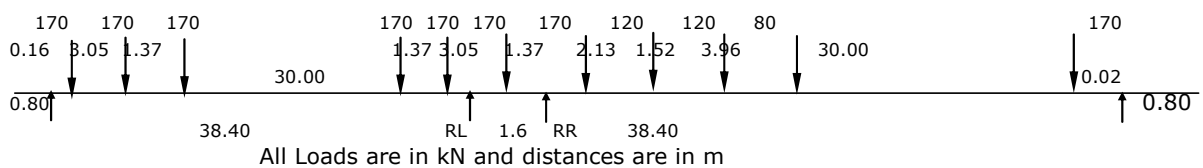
PLAN OF ROAD WAY FOR PIER
